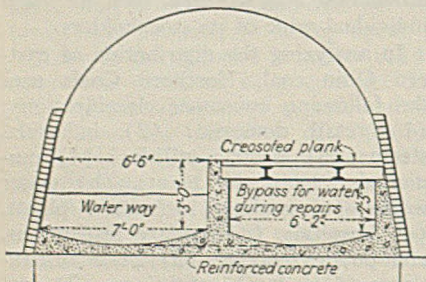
Cross-Section of Proposed South Wales Water Tunnels.
